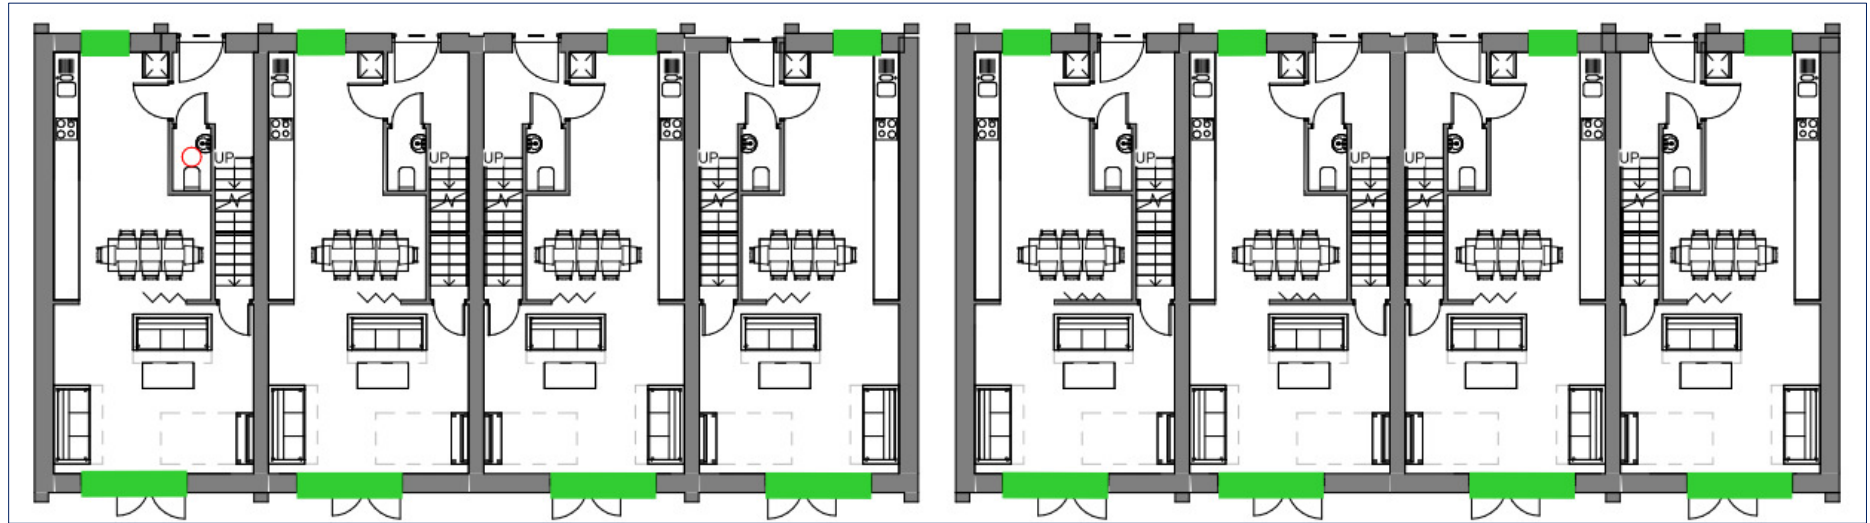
Recommended façade strategy – Townhouses, 1F
